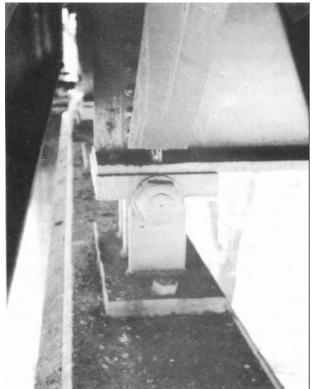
Metal bearings. (Sheet 3 of 4)
